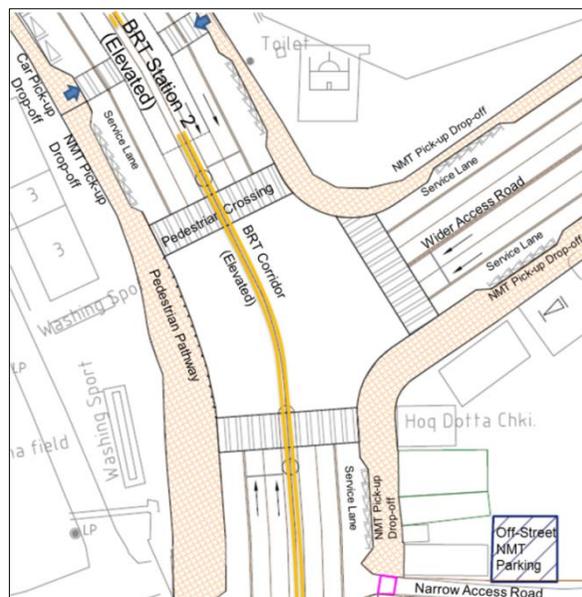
Accessibility Improvements for Wider Access Roads (8-15 M wide)
